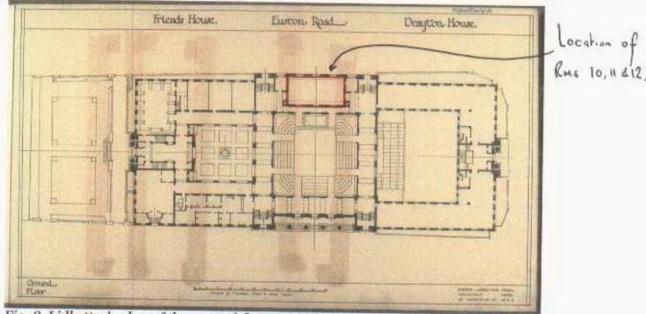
Lidbetter's plan of the ground floor, 1928 (FHL)
